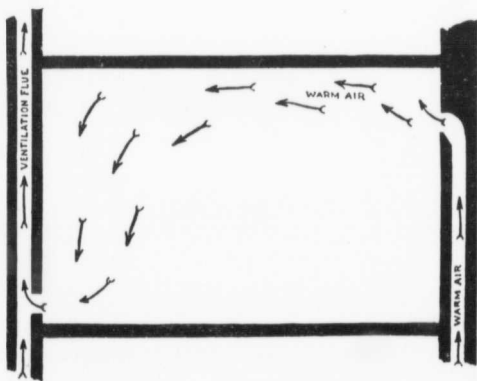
Inlet near ceiling: outlet near floor on opposite side: partial distribution
